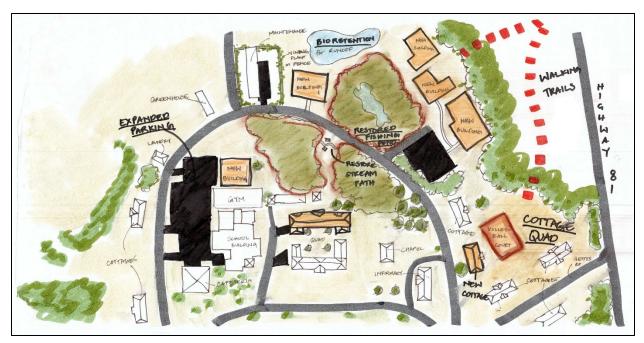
New School Buildings (Created by Saadia Rais)
